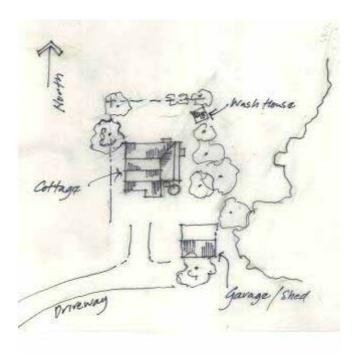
Site Plan Lot 5a Sawmill Camp
